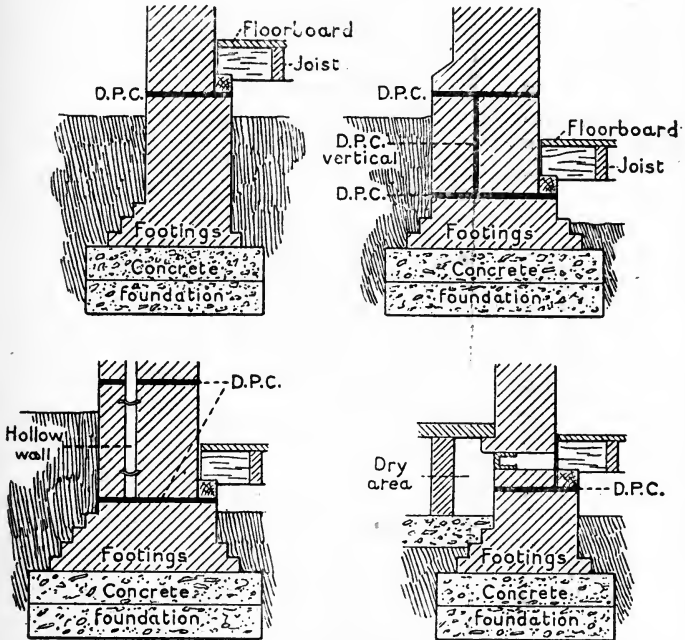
Showing methods of protecting a building against dampness. Damp-proof course (D.P.C.) is shown in each case below the lowest woodwork in the building.
